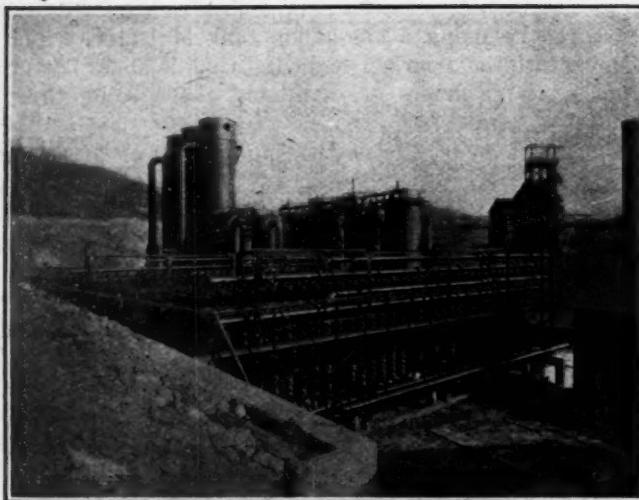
COOLING COILS FOR PRIMARY COOLERS
